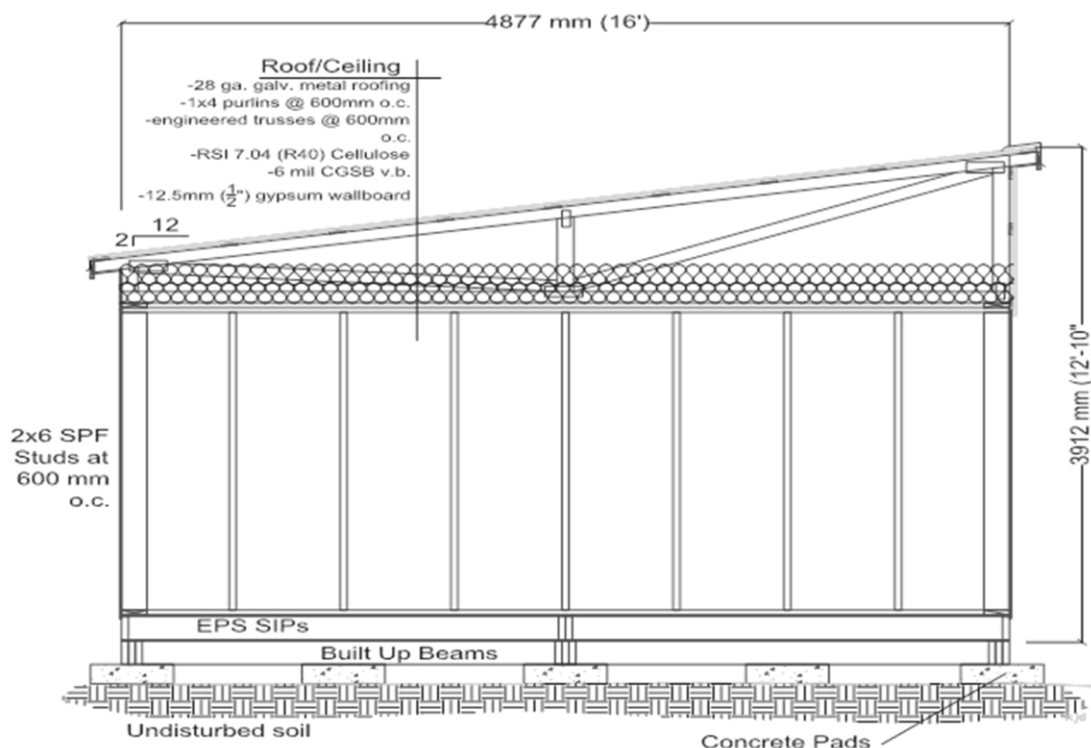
Typical cross section of wood frame buildings (source: Dr. K. Dick)
